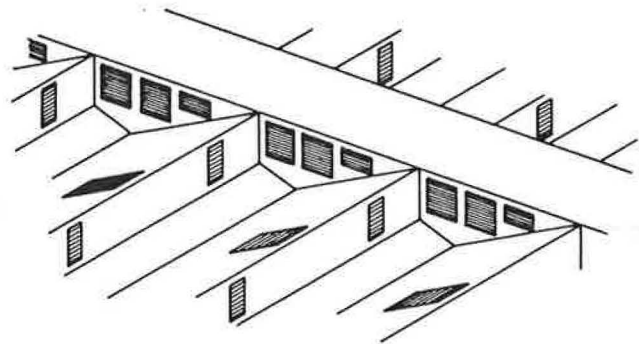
Ventilating devices in the roof and in a tunnel construction.
